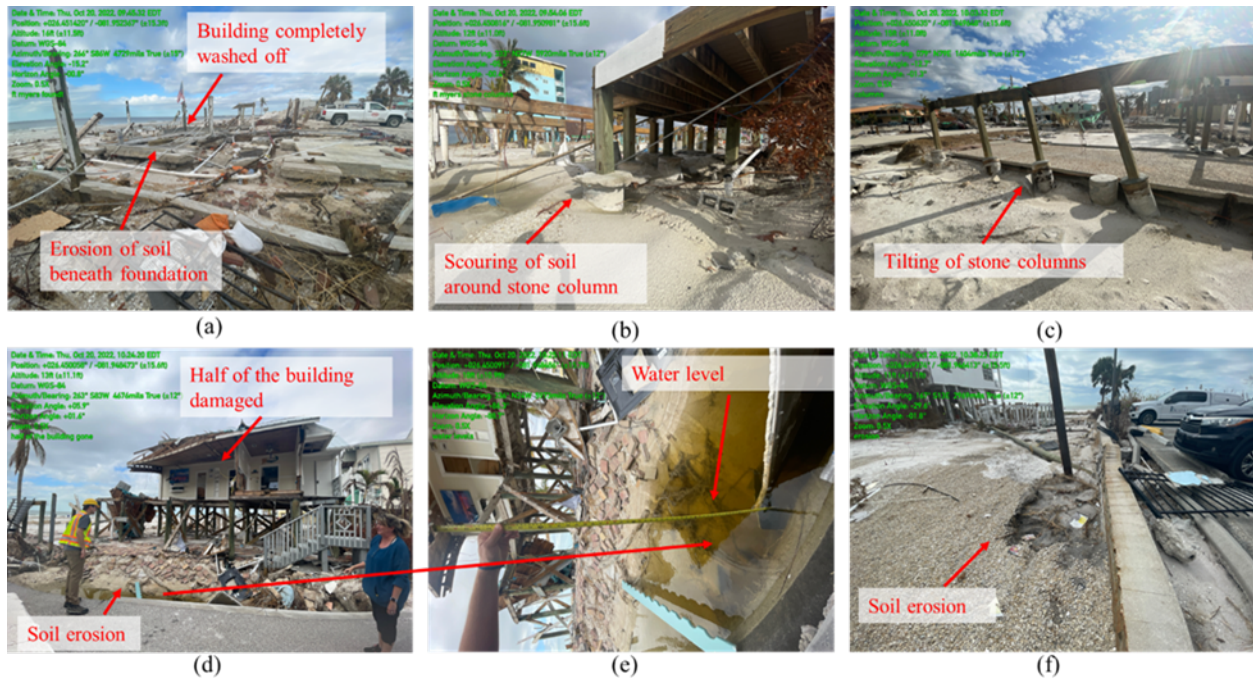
Surveying in Fort Myers Beach along the coast: (a) Buildings being completely washed off and soil erosion around the foundation (b) Scouring around the stone columns; (c) Tilting of stone columns and possible signs of erosion; (d) Damaged building and extreme soil erosion; (e) Survey of water levels near the building; (f) Soil erosion possibly causing tilting of pole. Coordinates: 26.44966, -81.94872
